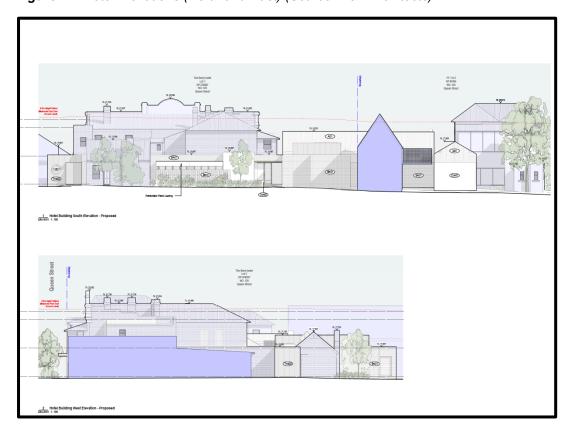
Hotel Elevations (South and West) (Source: H&E Architects)
